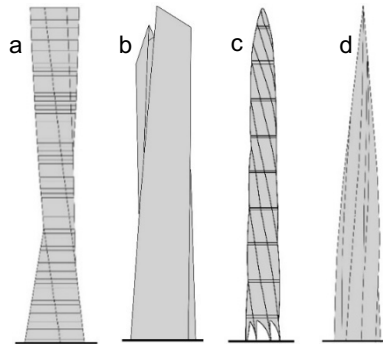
Twisted forms (a) Cayan Tower, Dubai, 2013; (b) Shimao Qianhai Project Tower 1, Shenzhen, under construction; (c) Chicago Spire, Chicago, never completed; (d) Lakhta Center, St. Petersburg, under construction
